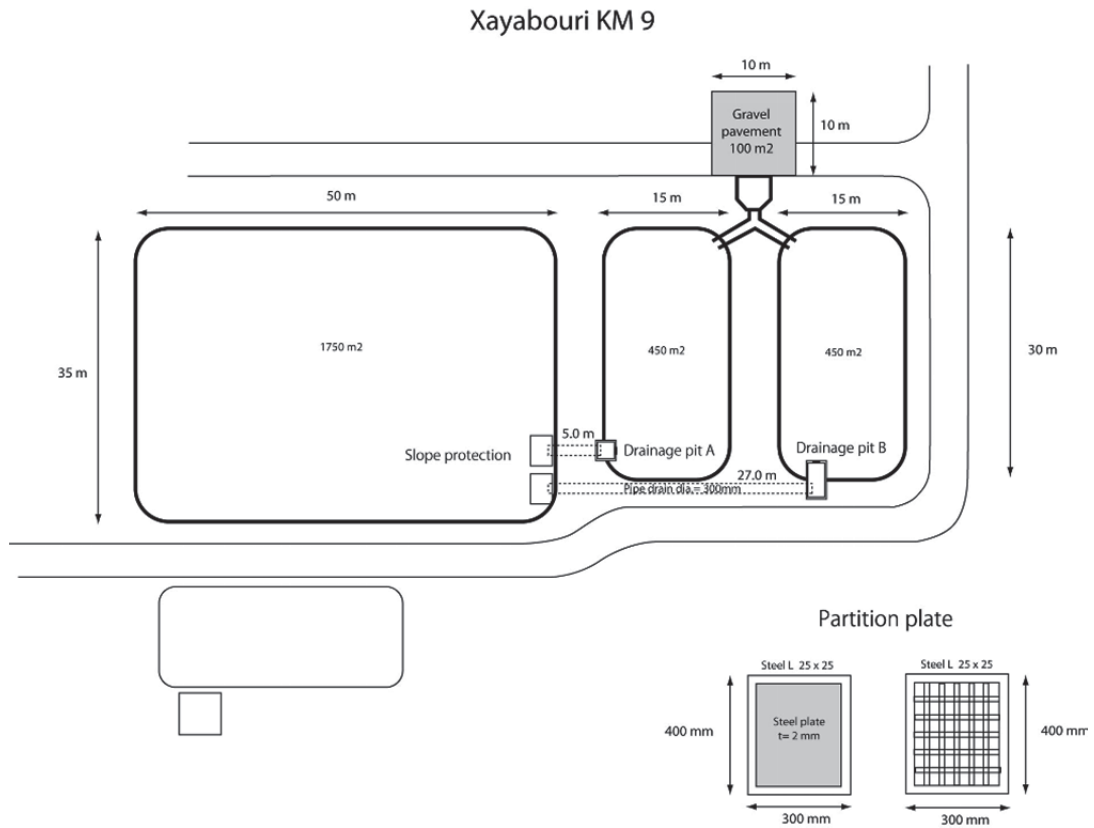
Layout of the treatment facility for the sludge from septic tanks
